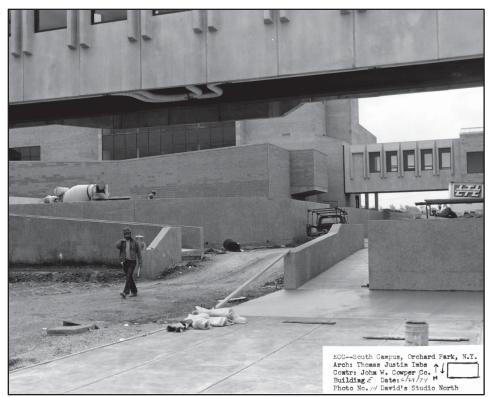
A June 29, 1974 view of the west side of the main court area looking southeast from Bridge 2-3 (Reproduced courtesy of SUNY Erie College Archives)
